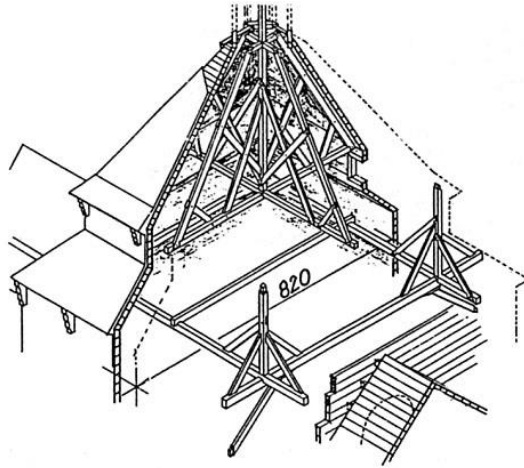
,22. Wooden Orthodox church - plan and cross-section diagram with basic functional and construction elements. Source: Kurek 1997.
